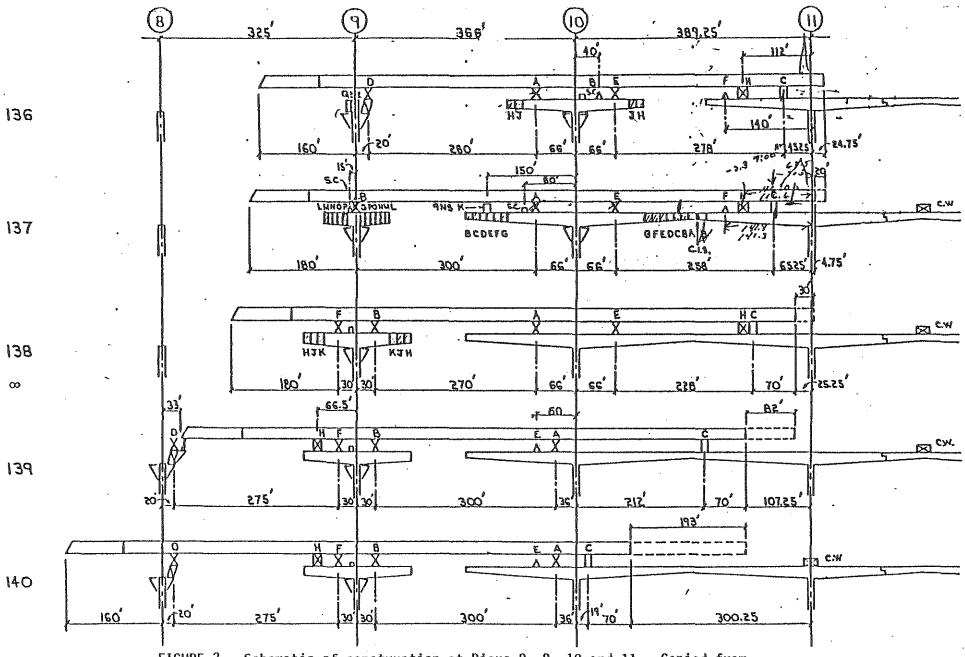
Schematic of construction at Piers 8, 9, 10 and 11. Copied from Launching Girder Handling Manual
